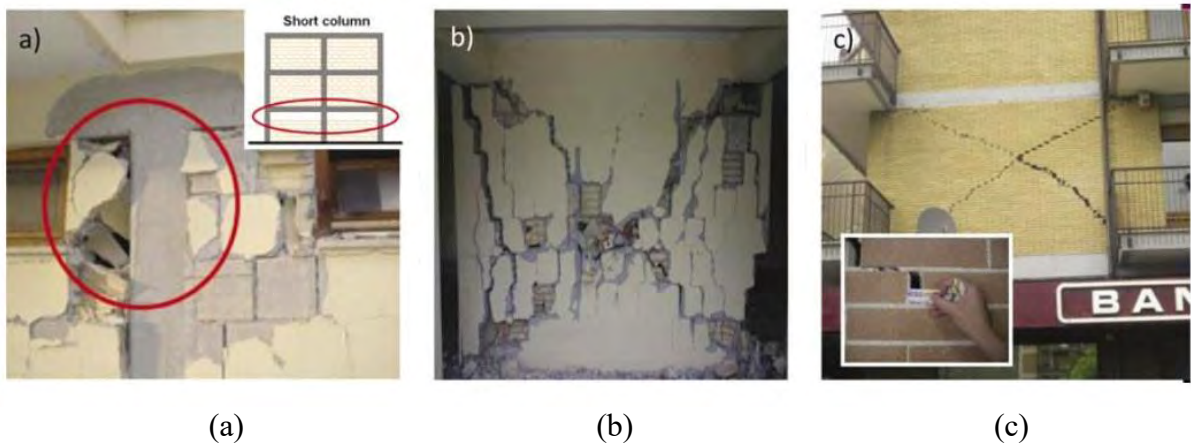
(a) Corner crushing of the infill; (b) in-plane cracking and crushing of masonry wall (c) horizontal bed joint sliding (Vicente et al., 2012).
